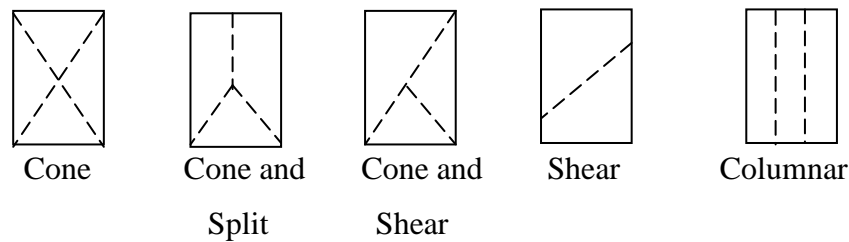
Various Failure Patterns of Concrete Cylinders
